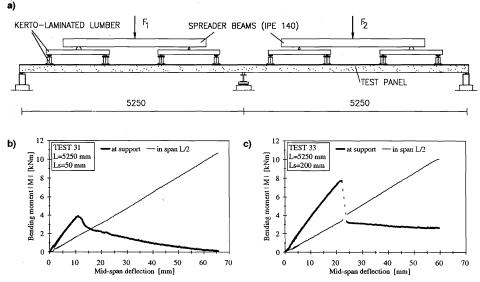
Experimental bending moment - deflection curves of full-scale two-span sandwich panels loaded by four line loads in each span. The first failure modes in the tests are a core crushing failure (Test 31) and a face bending and buckling failure (Test 33).
